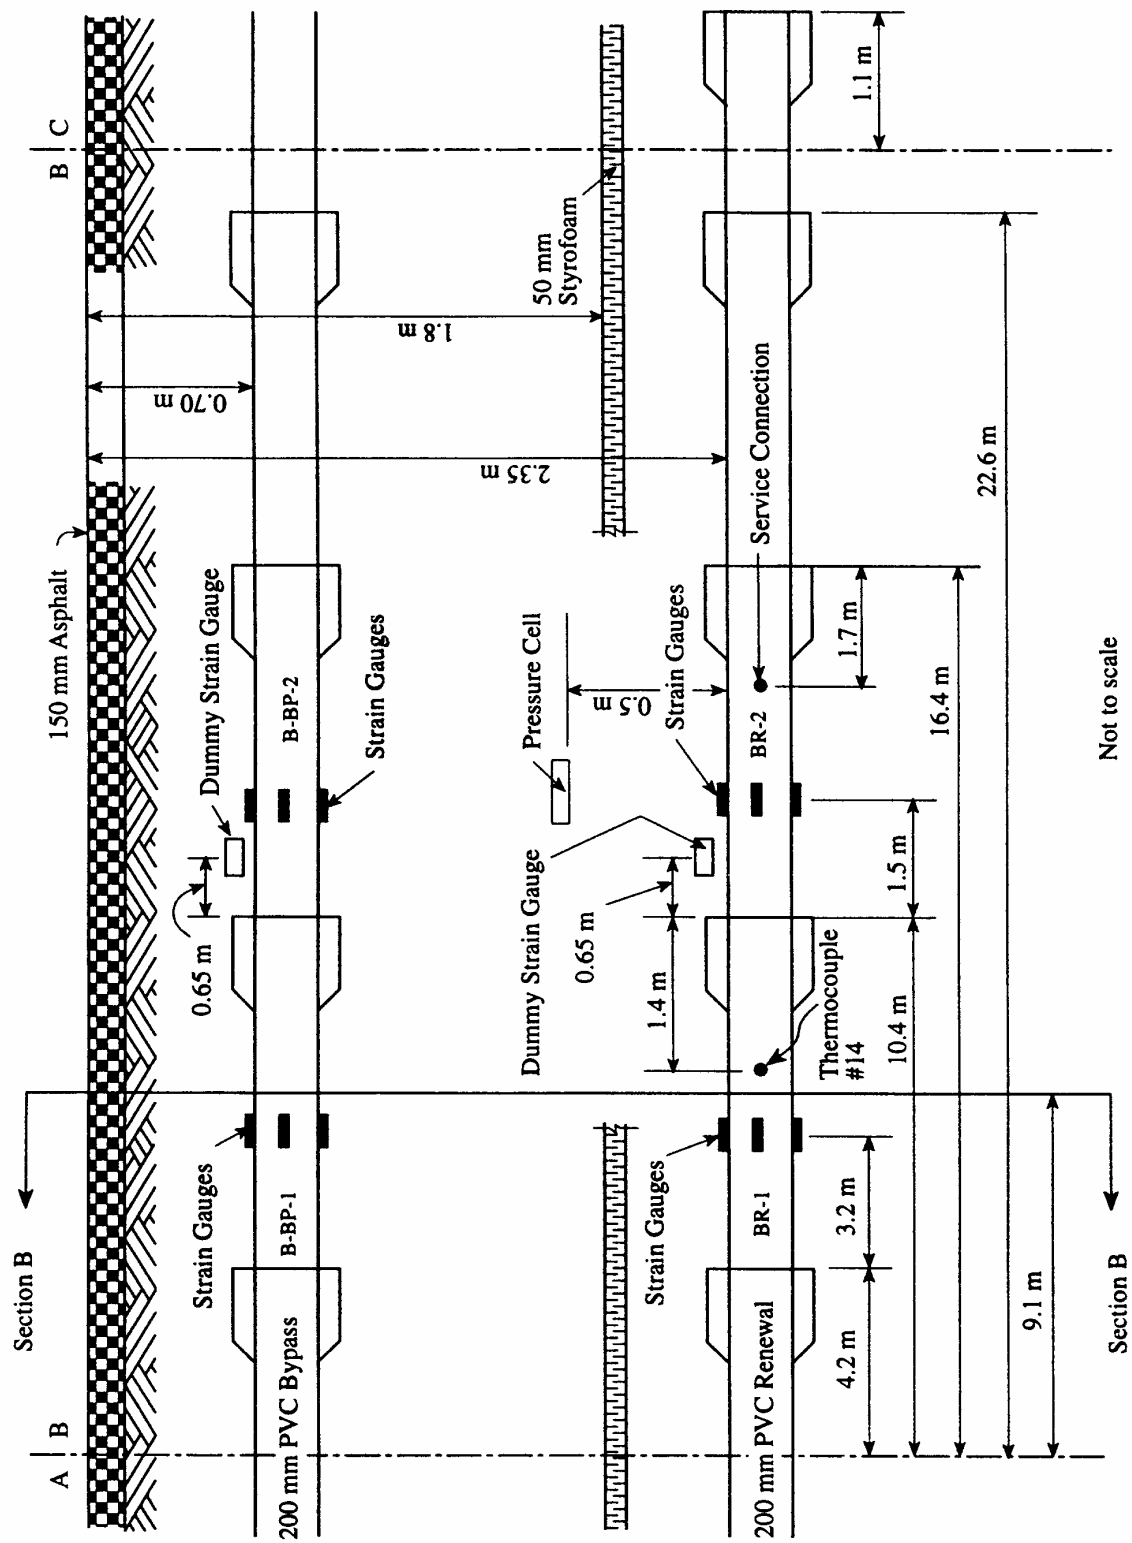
Longitudinal section of bypass and renewal pipes with clean sand trench backfill (section C)
